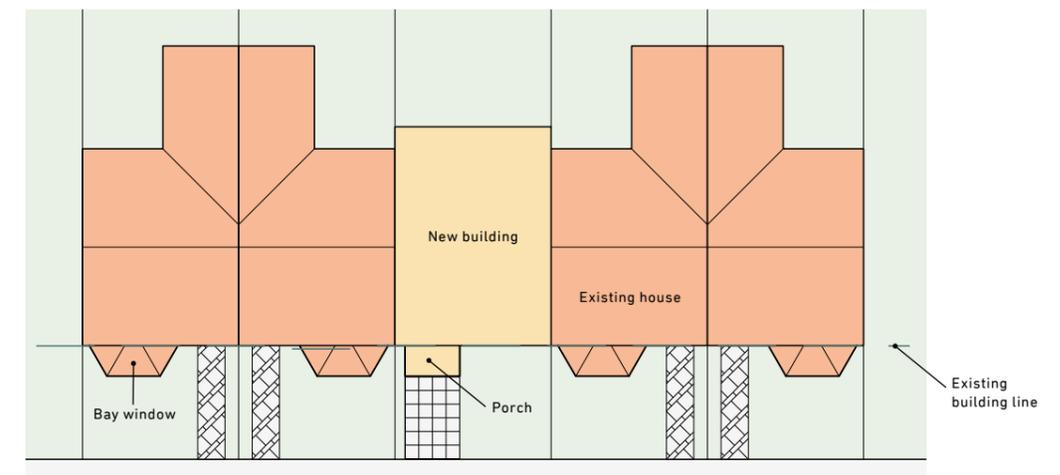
The prevailing building line is defined by the principal face of an existing building or street facing the public highway. Minor projections, such as bay windows or porches, are excluded.
